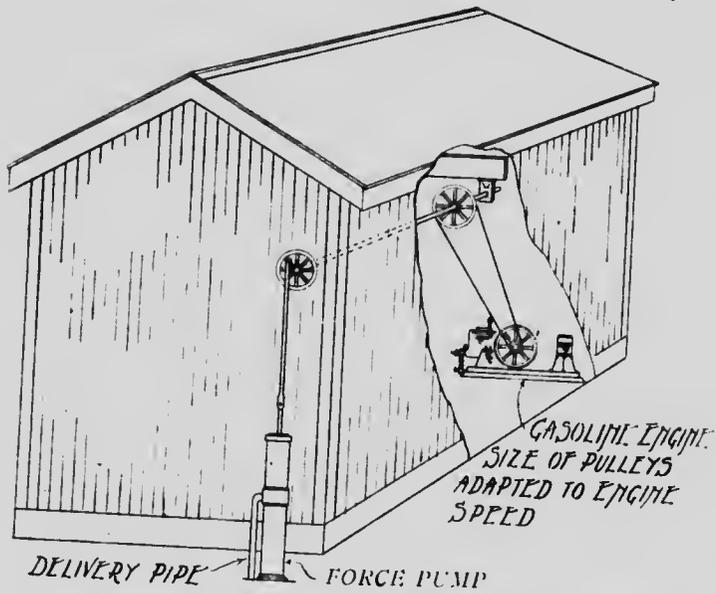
Pump operated by pulley on line shaft driven by gasoline engine.
